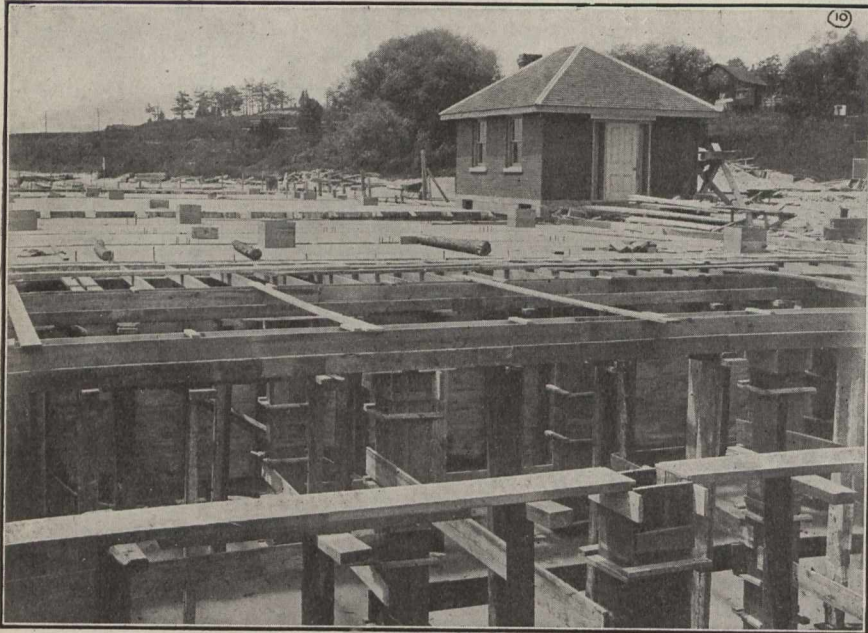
Filter Column and Roof Forms in Place. The Small Building at Right is Low-lift Pumping Station
